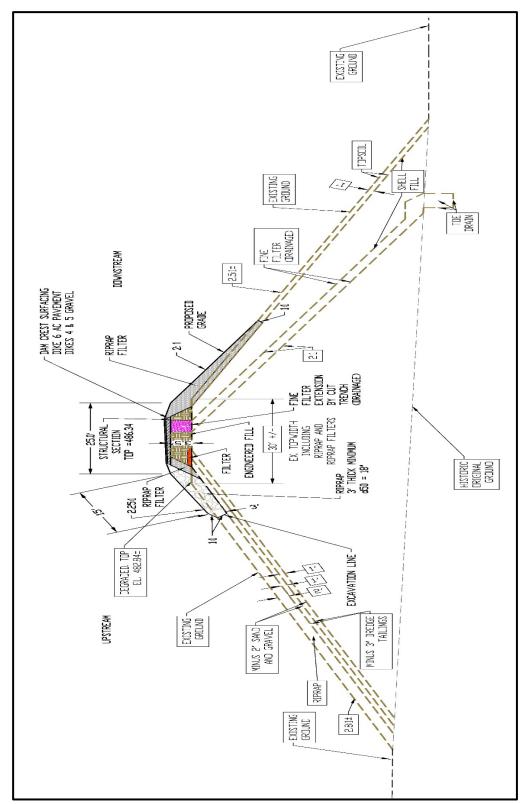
Preliminary typical cross section for 3.5-foot raise at Dikes 4, 5, and 6.
